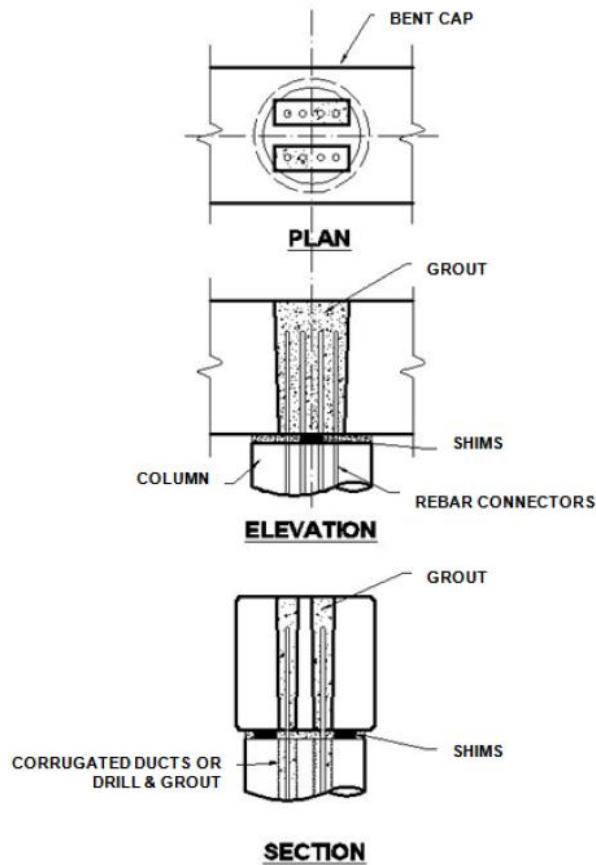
Precast column to bent cap connection with grouted pocket (Restrepo et al. 2011)
